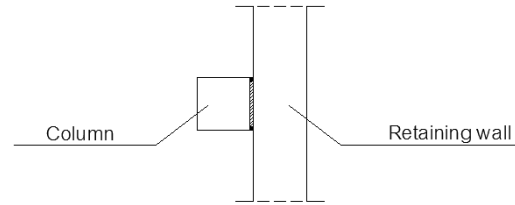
Detail of the connection between the retaining walls and the introduced columns shown in green in Figure 2.
